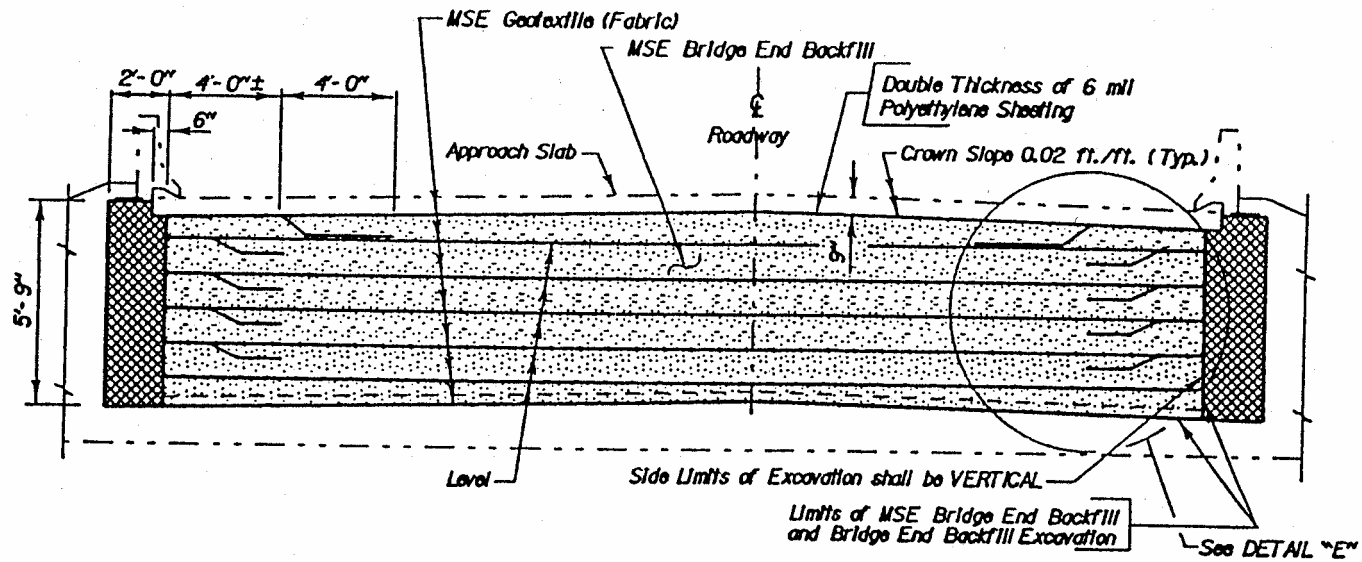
Design detail of a typical MSE geotextile reinforced soil wall from the back showing the side wraps and the drainage fabric along the wing walls since 1999
